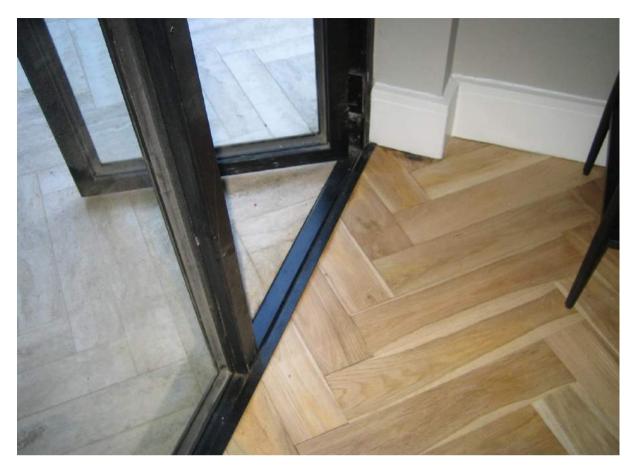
Water penetration and damage in N/W corner of bedroom 1 in Unit G01.
